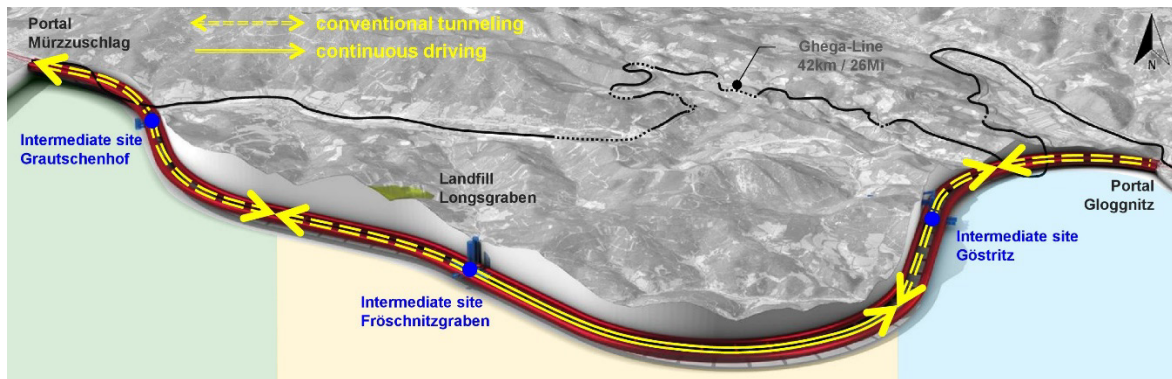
Semmering Base Tunnel - Project overview (ÖBB/3D-Schmiede).
